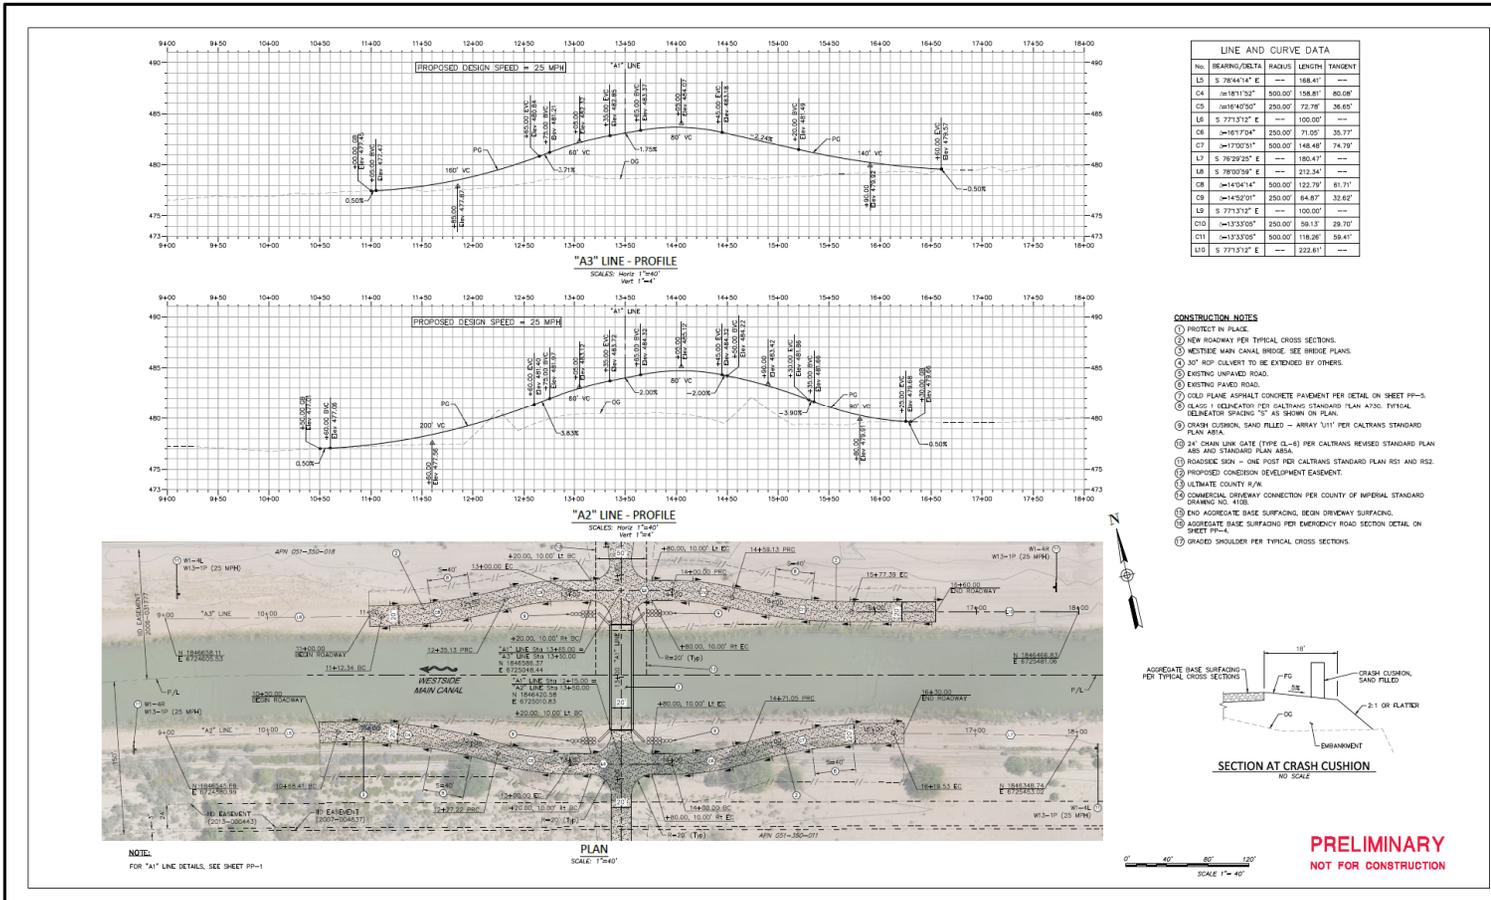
Westside Main Canal Bridge Site Plan
